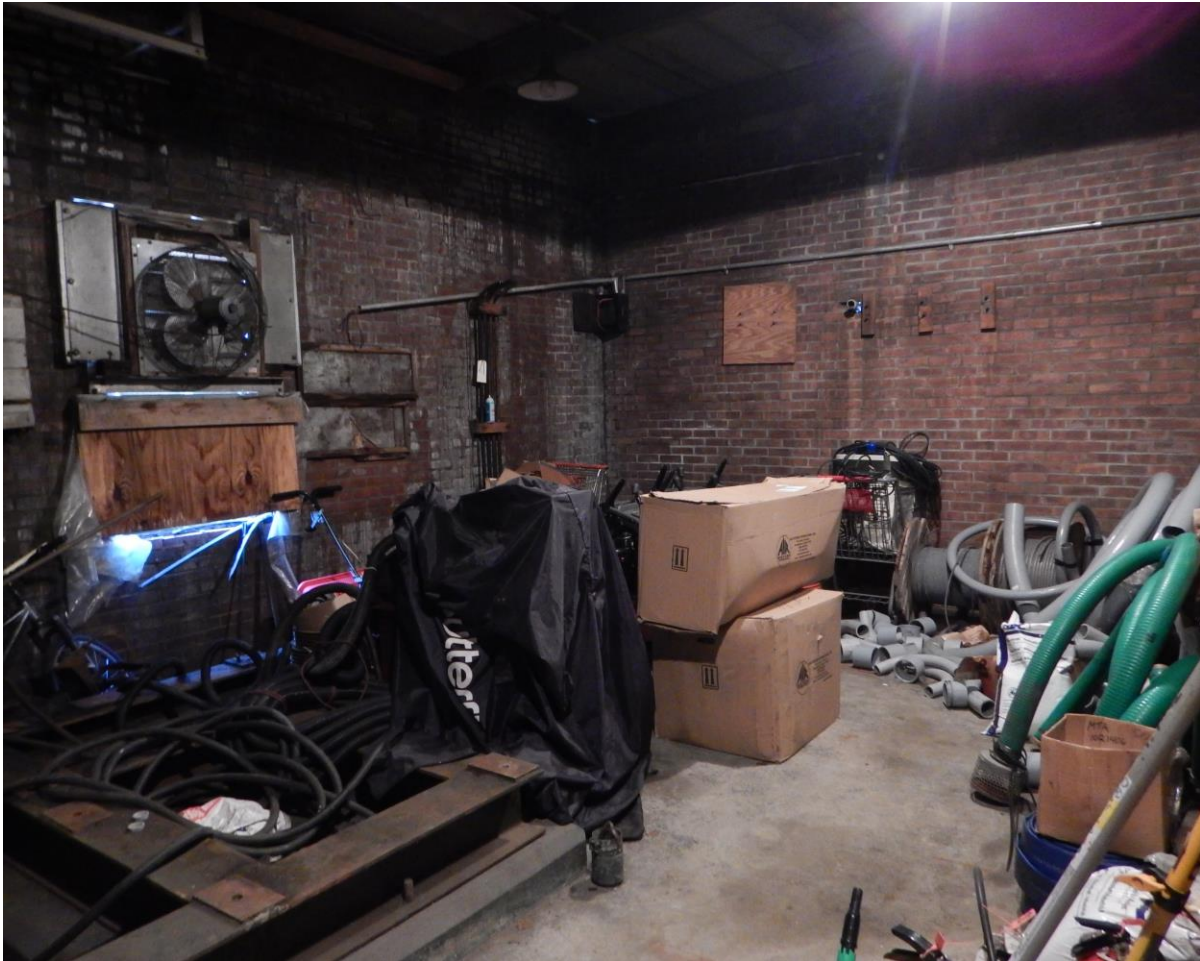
INTERIOR ADDITION FACING NORTHWEST
